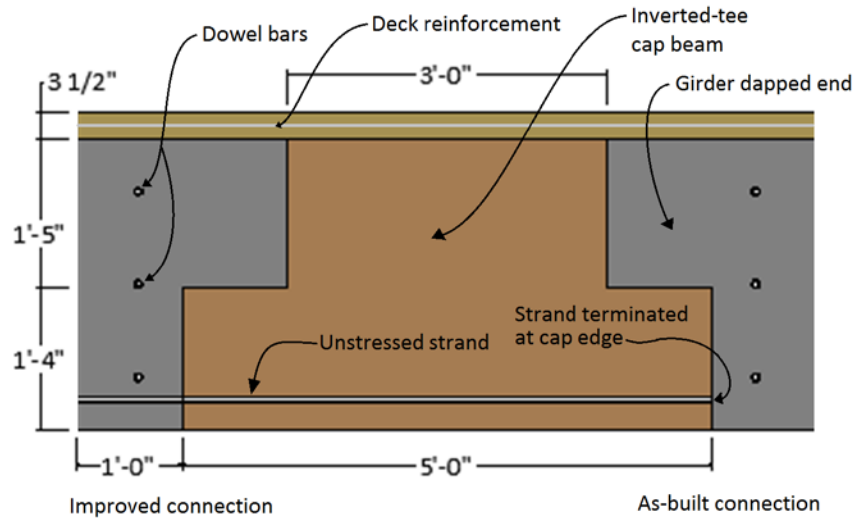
Improved girder-to-cap connection detail utilized in the system test
